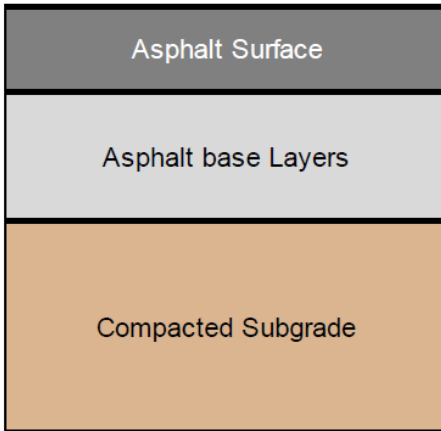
Cross section of full-depth HMA pavement (Not to scale) (T. J. Van Dam et al., 2015, p. 4.10)
